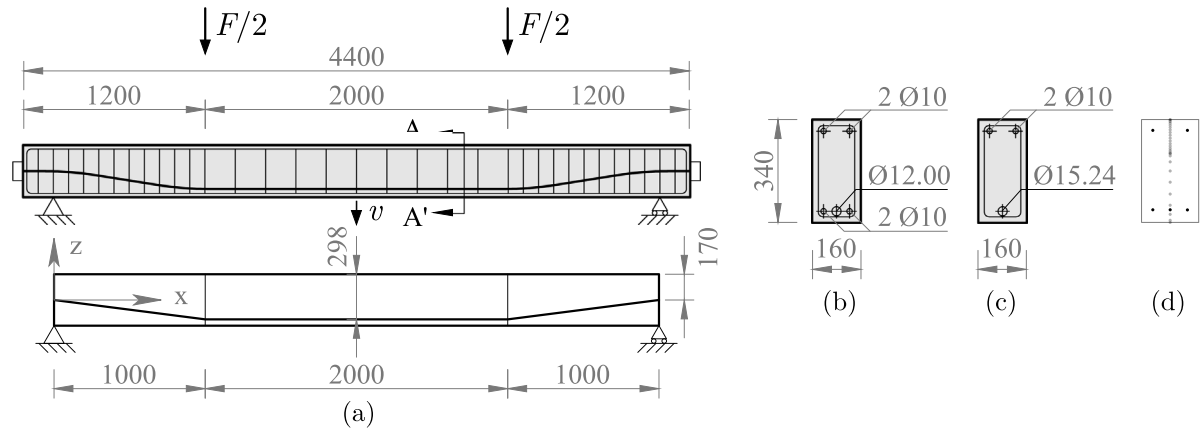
Simply supported prestressed beam with a polygonal bonded tendon [33]: (a) longitudinal view; (b) cross-section A-A' of the beam B2-70-N-B; (c) cross-section A-A' of the beam B3-70-N-B; (d) fiber section discretization.
